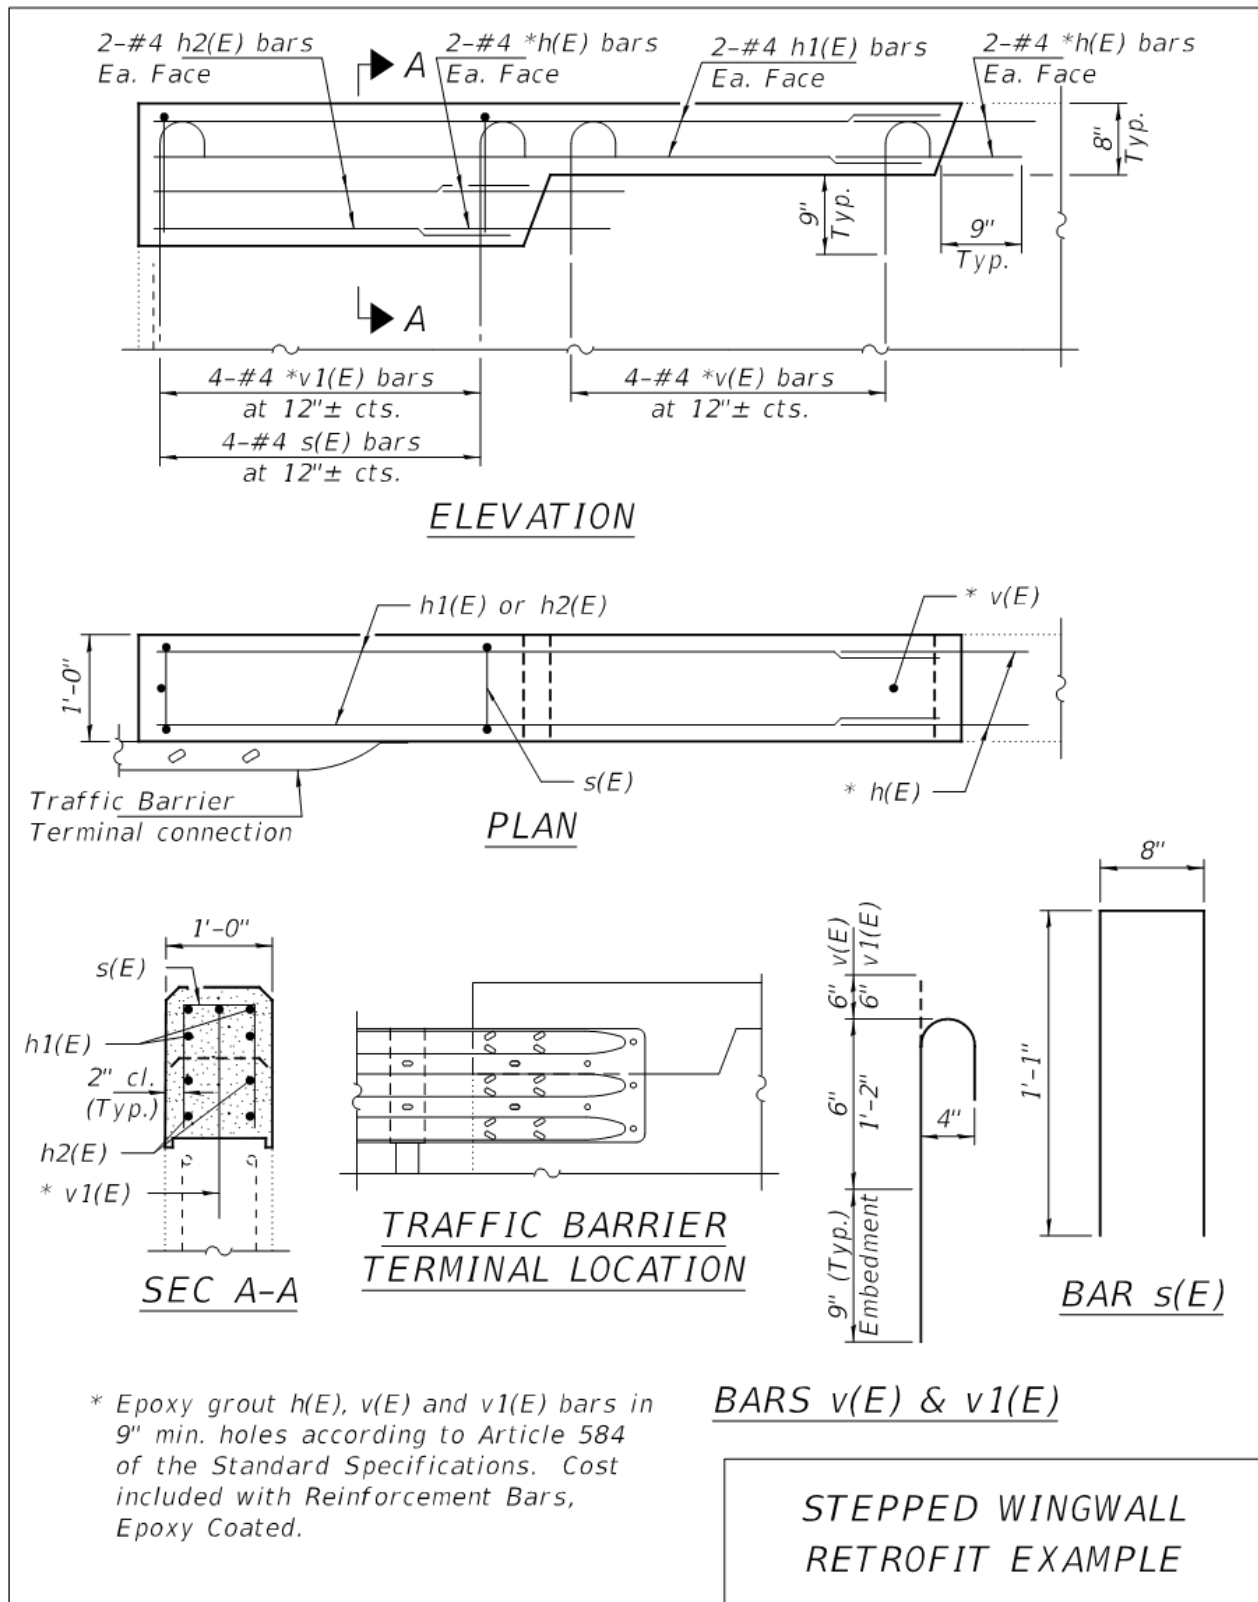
Example – Stepped Wingwall Retrofit
